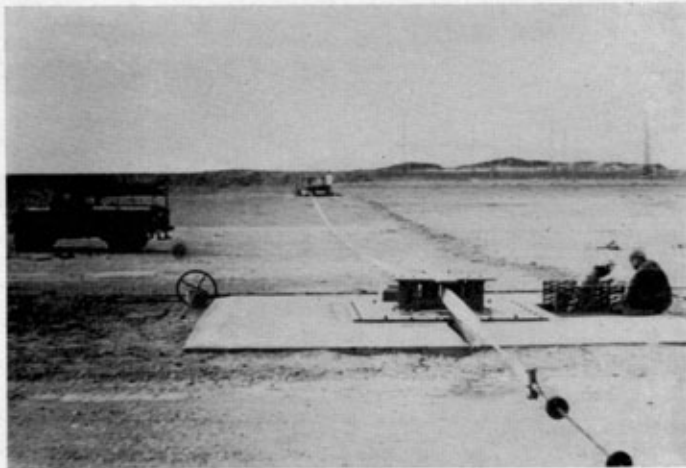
A completed retractable runway edge sheave at RAF MASIRAH—sheaves raised
